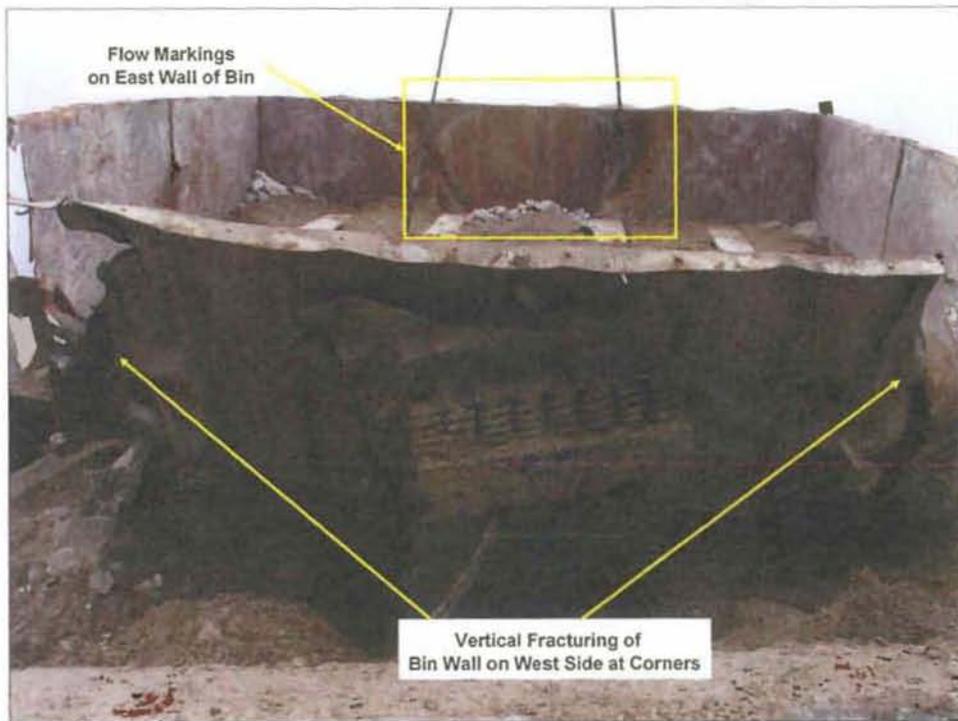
Bottom section of the bin showing wall markings and fractures.
